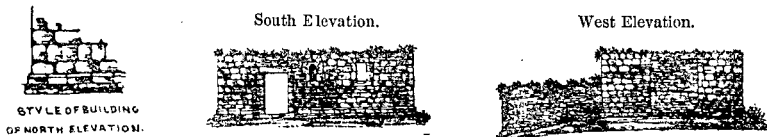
Style of Building, and South and West Elevations of Chapel.
